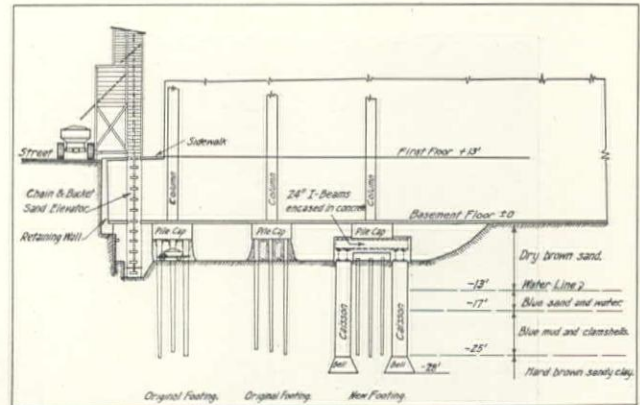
Cross-Section Through Portion of Building Showing Footings
